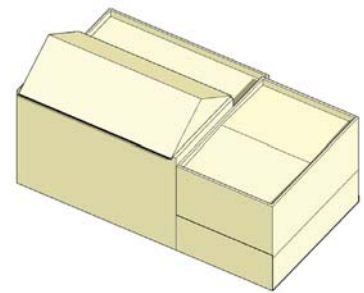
Basic massing, articulation, and opening strategies should relate to each other and break down the scale of the buildings.
